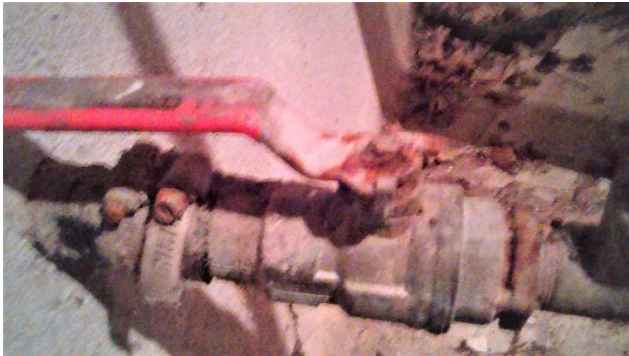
1" Galvanized Steel Pipe Comprising Water Service Entering Basement on the North
